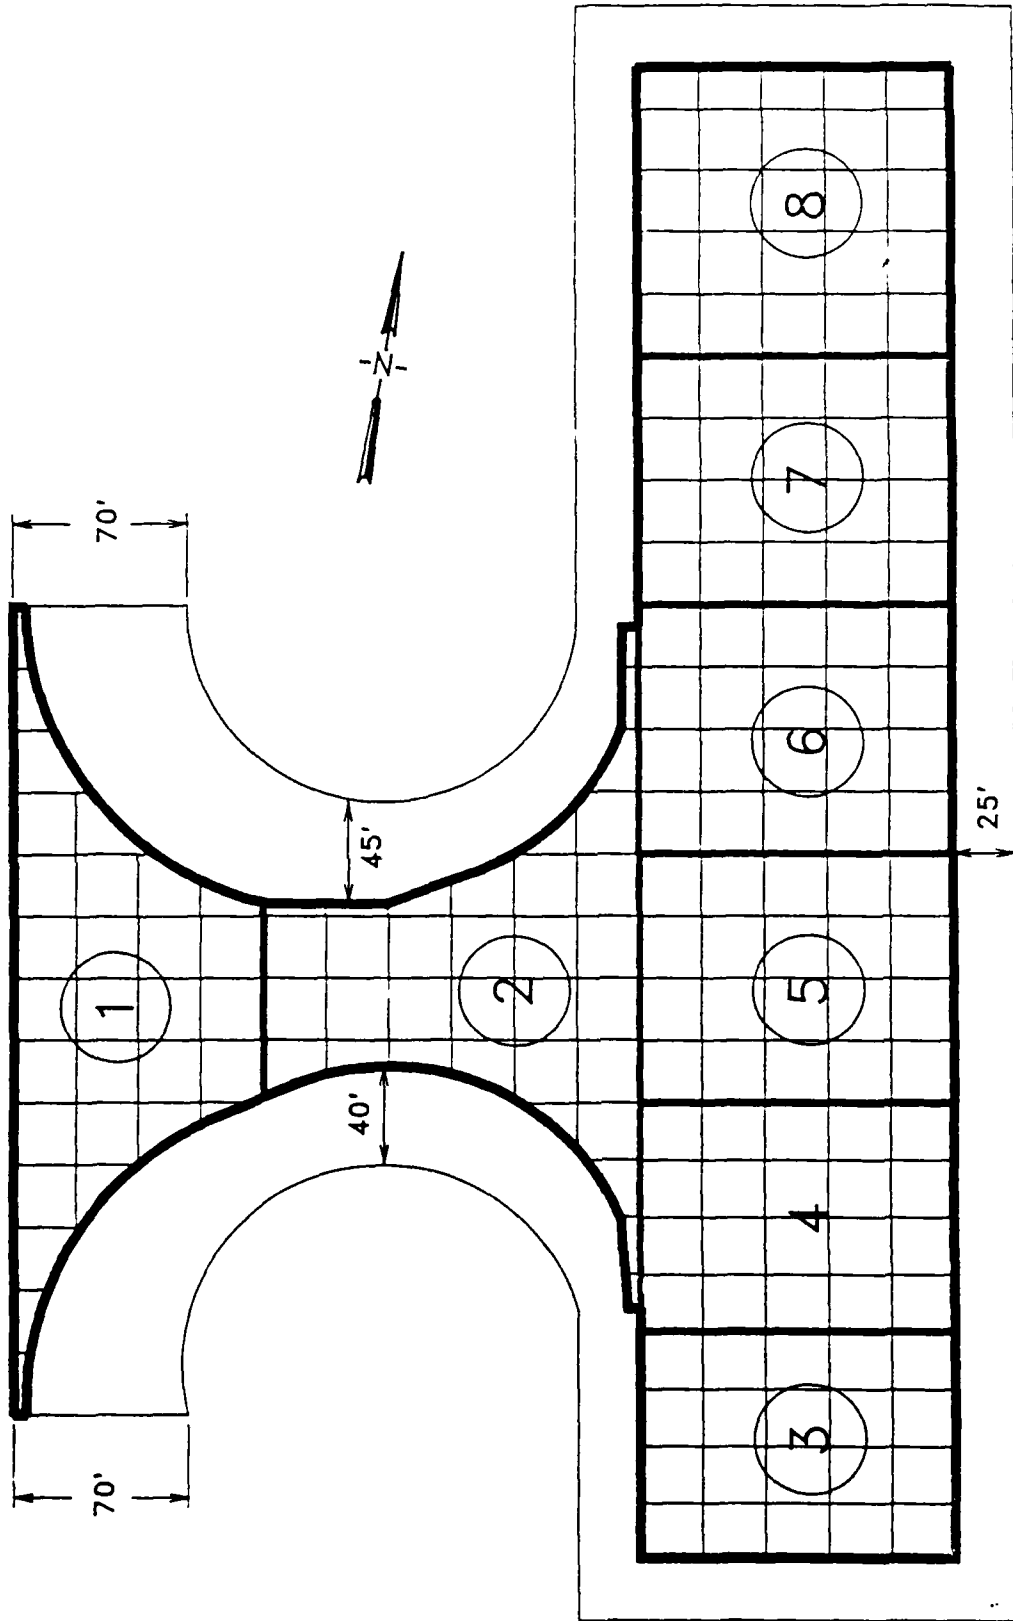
Sample unit layout, Pad 16 blast pad (feature A27B)
